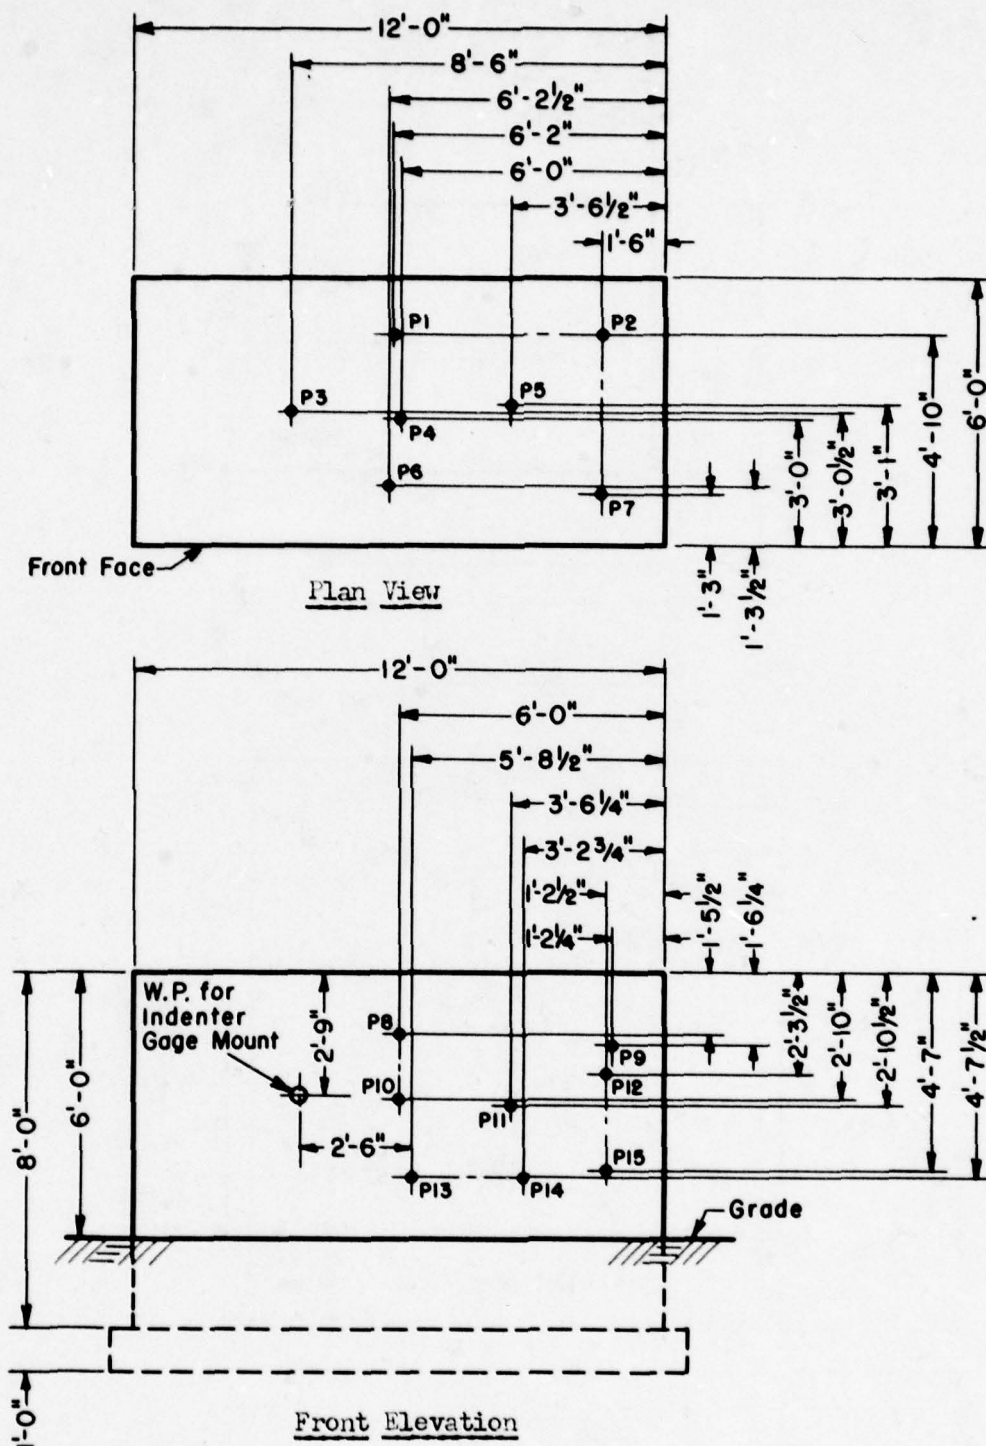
Structure 3.1t, plan view and front elevation.
